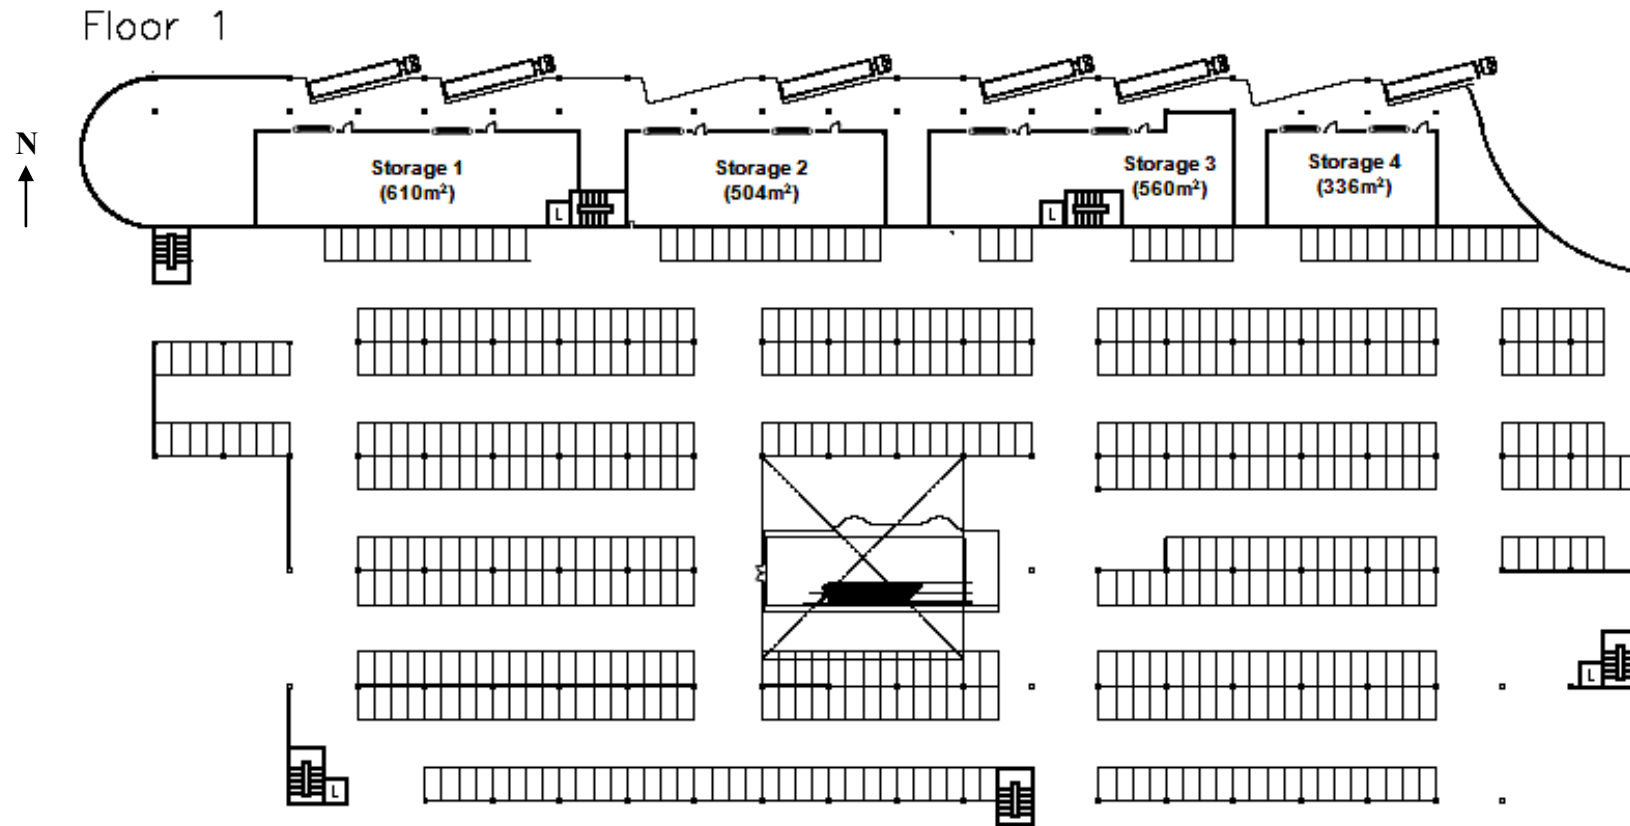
Designed Shopping Mall Building Plan – Floor 1 (Ground Floor)
